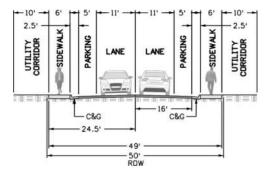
8 Residential Typical Section - Attached Sidewalk
